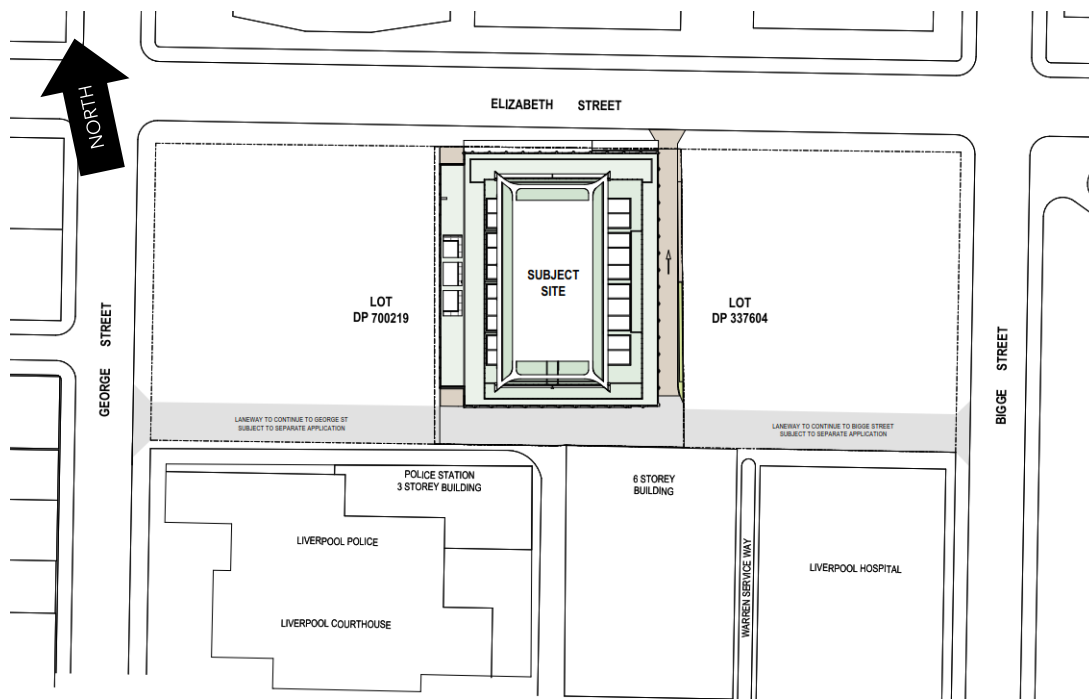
Proposed Site Plan (Source: Rothelowman)
